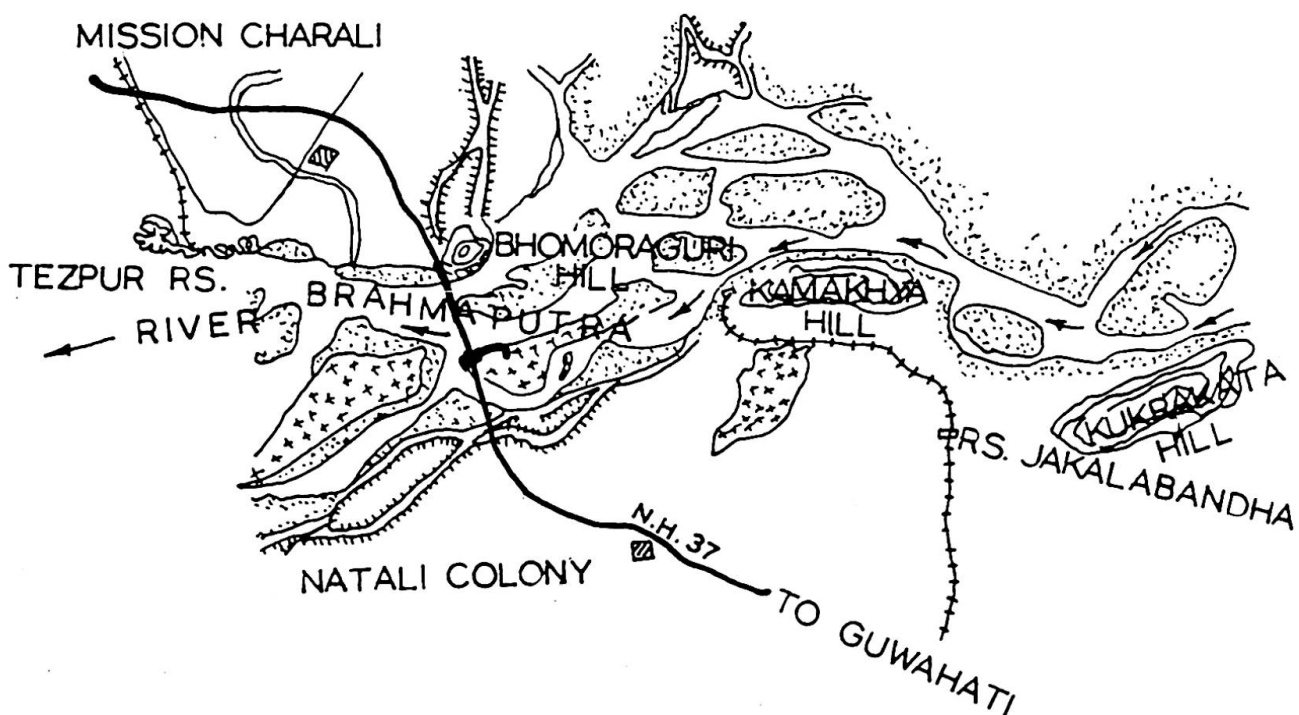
LOCATION PLAN OF TEZPUR BRIDGE
